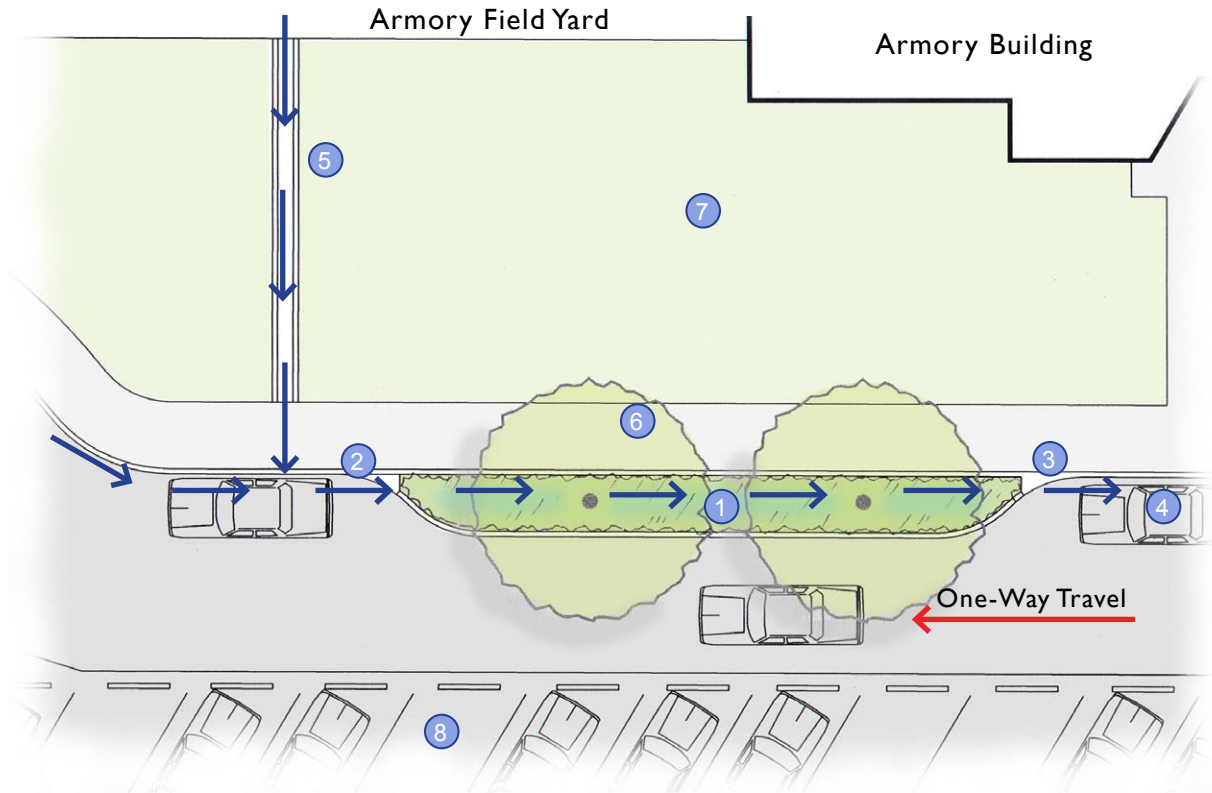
The new stormwater curb extension will convert approximately three on-street parallel parking stalls into a landscape stormwater system.
